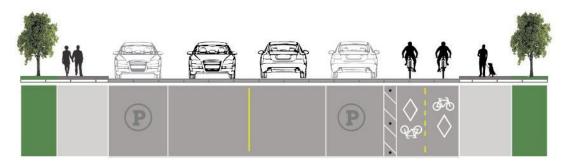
Cross-section of Esquimalt Road (Robert Street to Catherine Street).
